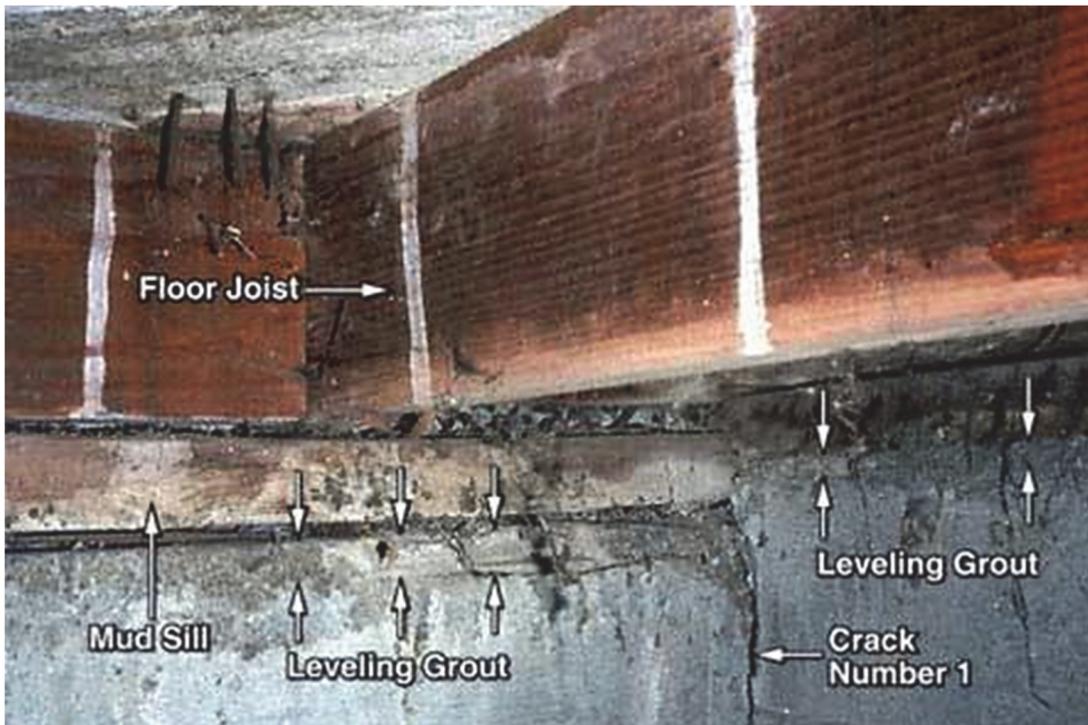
Releveling of foundation indicates prior settlement and possibly on-going deformation mode rather than earthquake damage (photo credit: Exponent).
